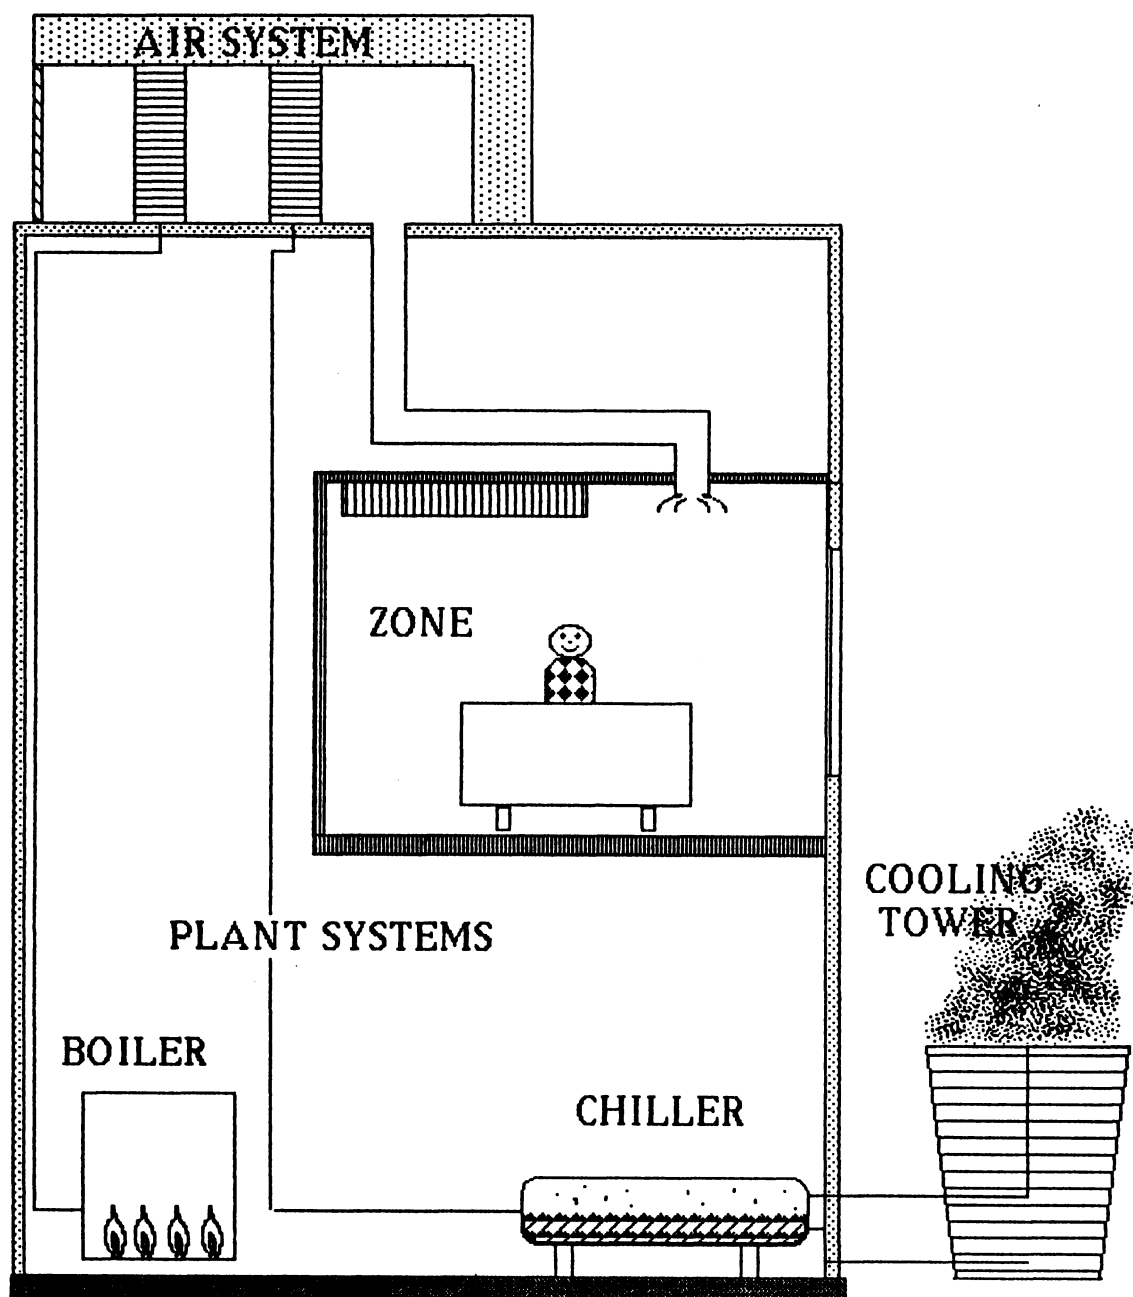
Typical Large Building Zone Served By HVAC Coil and Plant System.
